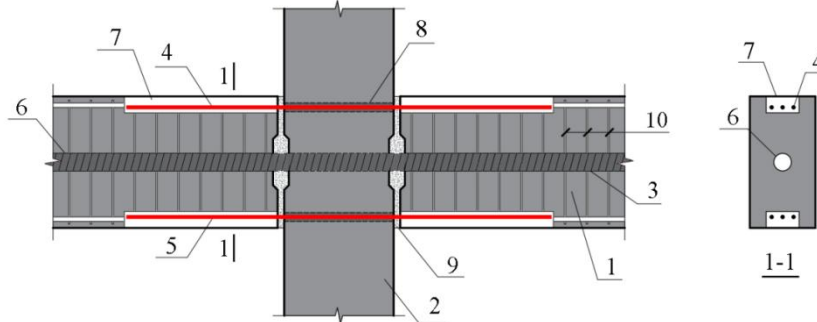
Prestressed precast concrete frame joints (1 - Precast beam; 2 - Precast column; 3 - Prestressed tendons; 4 - Top energy-dissipating bars; 5 - Bottom energy-dissipating bars; 6 - Corrugated pipe; 7 - Reserved notch at the beam end; 8 - Reserved hole in the column; 9 - Grouted joint; 10 - Stirrups)
